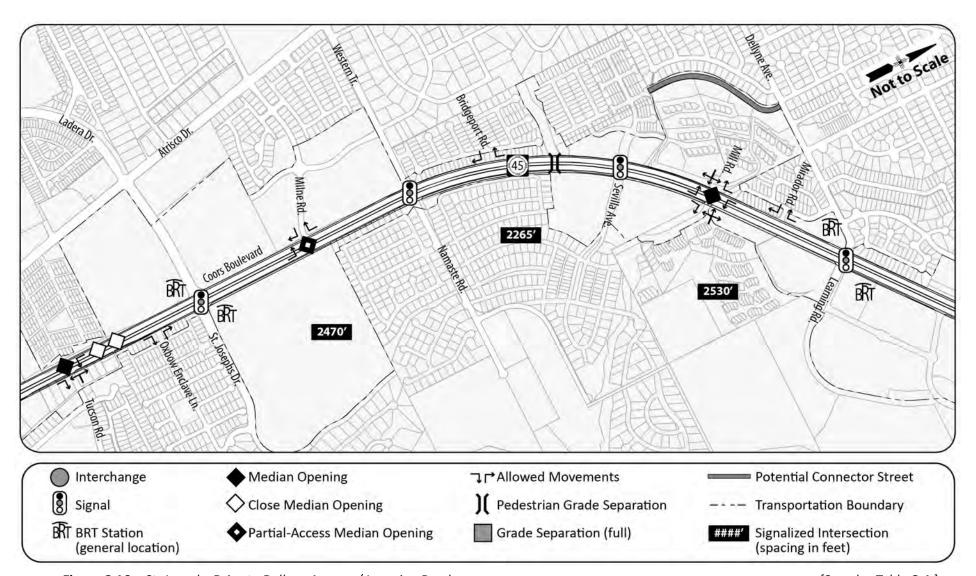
St. Josephs Drive to Dellyne Avenue / Learning Road
